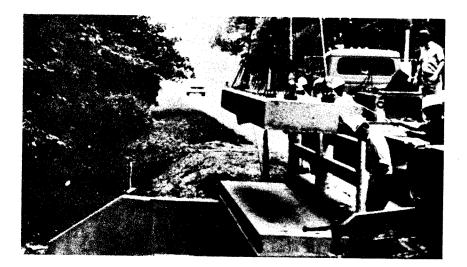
Precast slab being installed by Suffolk District bridge crew to widen Rte. 58 over Spivy Swamp.
